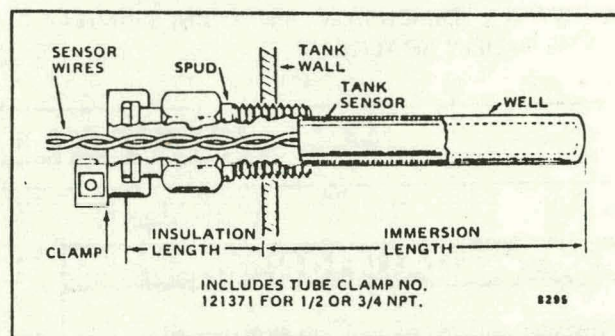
TANK SENSOR INSERTED IN IMMERSION WELL.
